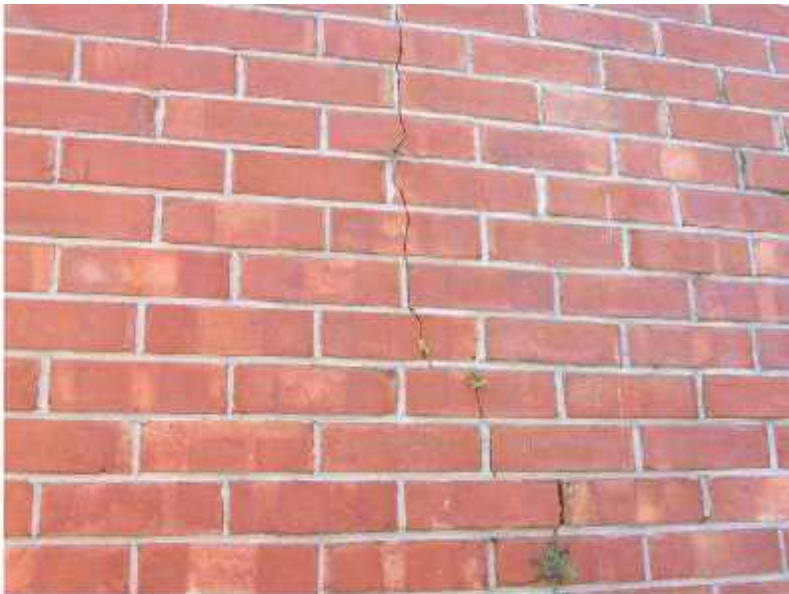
Moderate Vertical Cracking through Brick Veneer at Right Wall of Flat 7 (Photo 3 of 5) Looking Southeast
